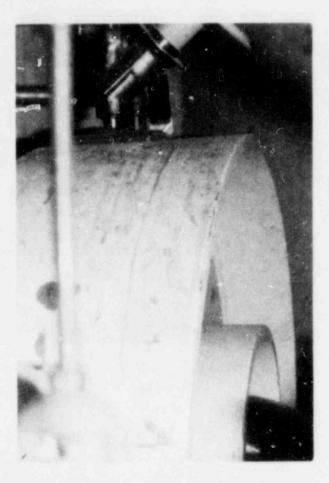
Pipe whip restraint, weld inaccessible for inservice inspection
